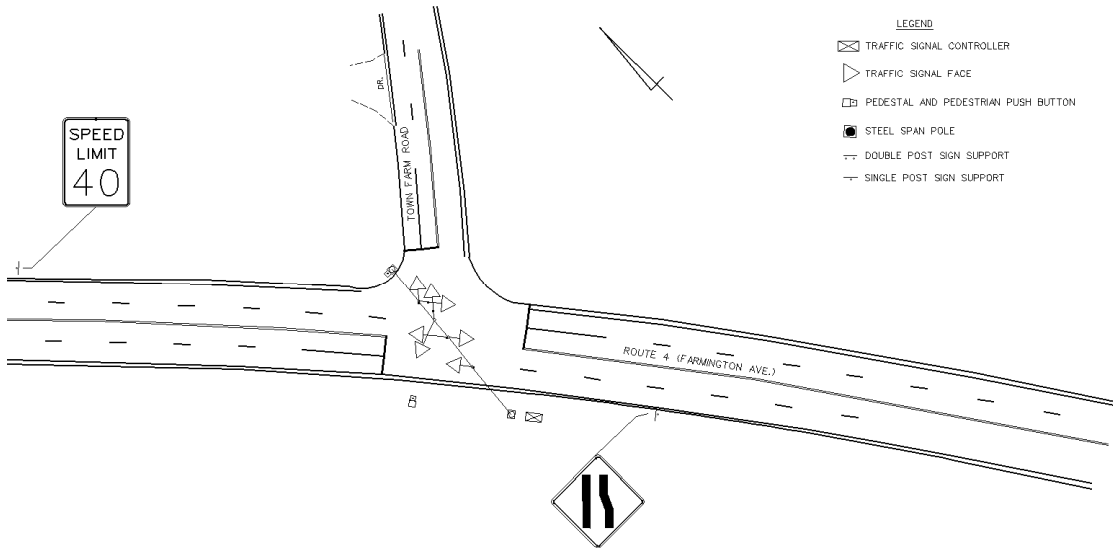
A Intersection of Route 4 and Town Farm Road, Farmington
